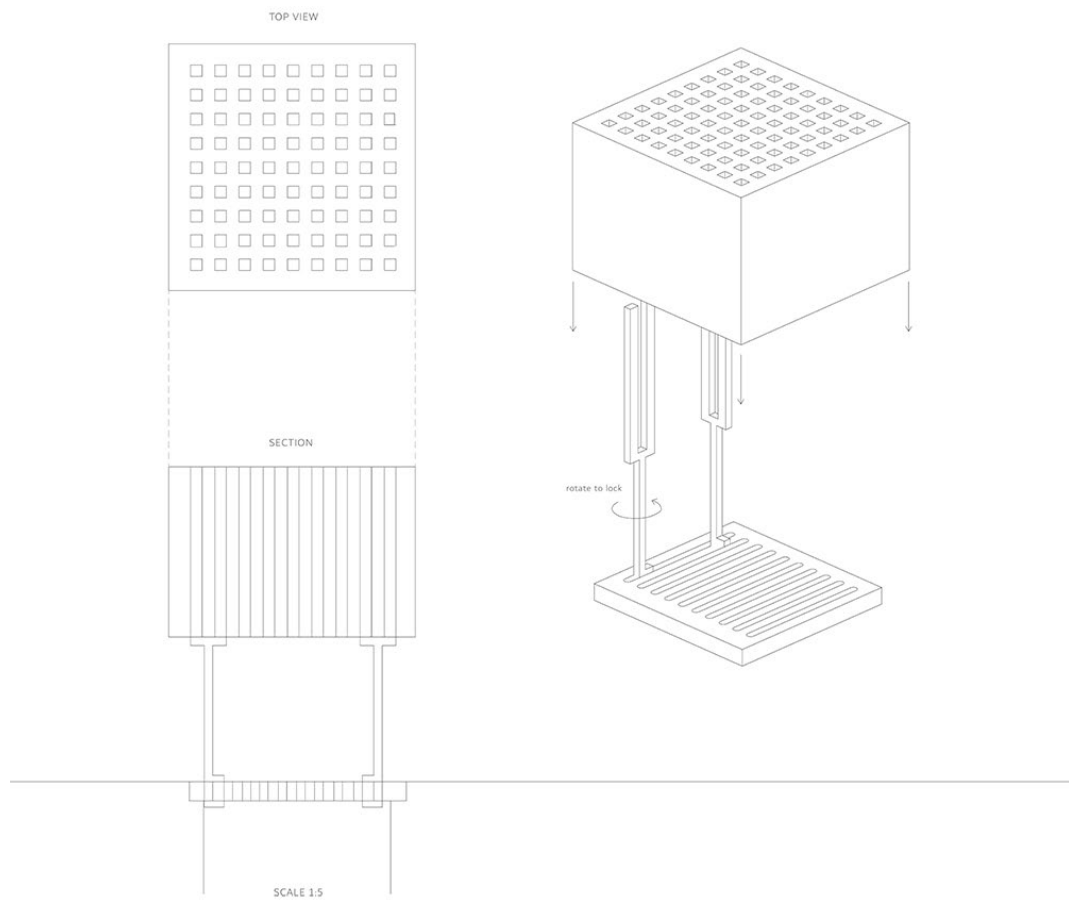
Drawing of proposed pop-up plinth anchored on stormwater drain, 2023, Auckland.
